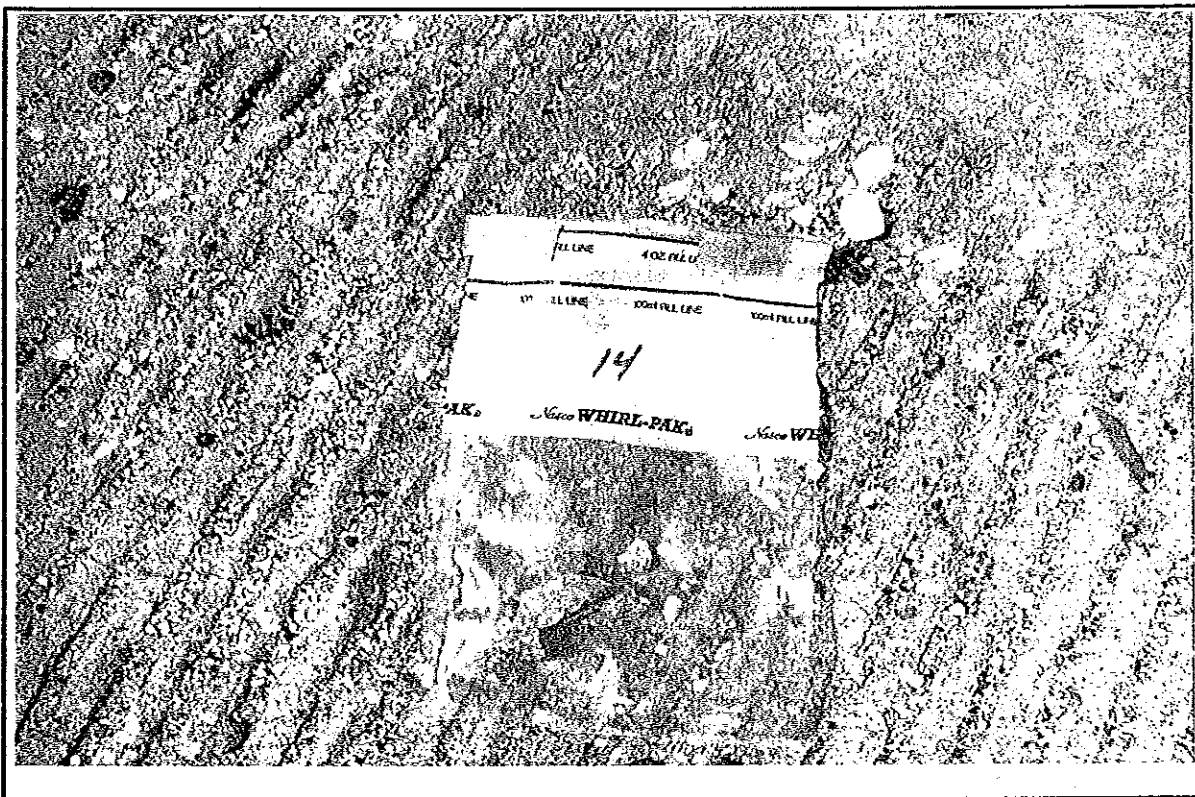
Asphalt Paving Westbound near North Brush Street
